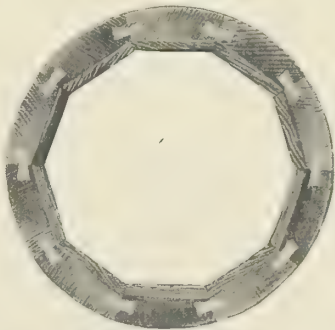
DUPLEX DOWELED COLUMN Showing Construction
